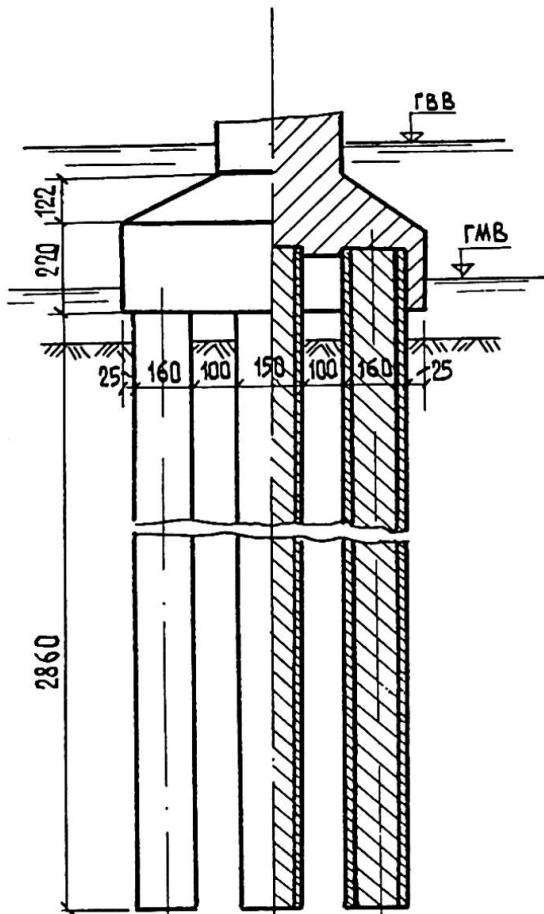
Bridge pier foundation made up of 1,6 m diameter shelled pile
